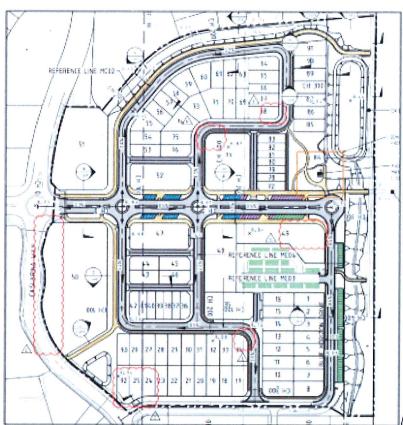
Proposed Subdivision Layout, showing proposed allotment layout, roads, parking and shared path layouts (source: application
